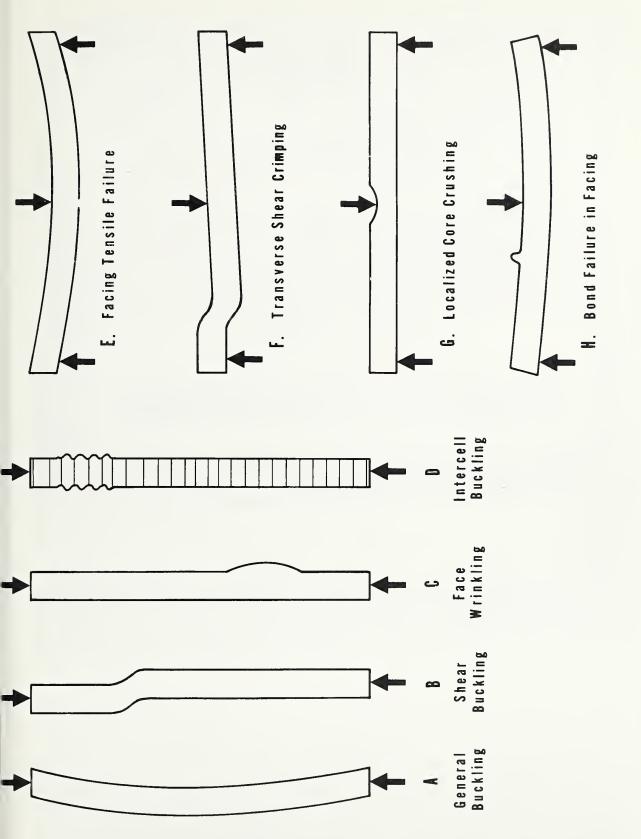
Possible Modes of Failure in Sandwich Panels
